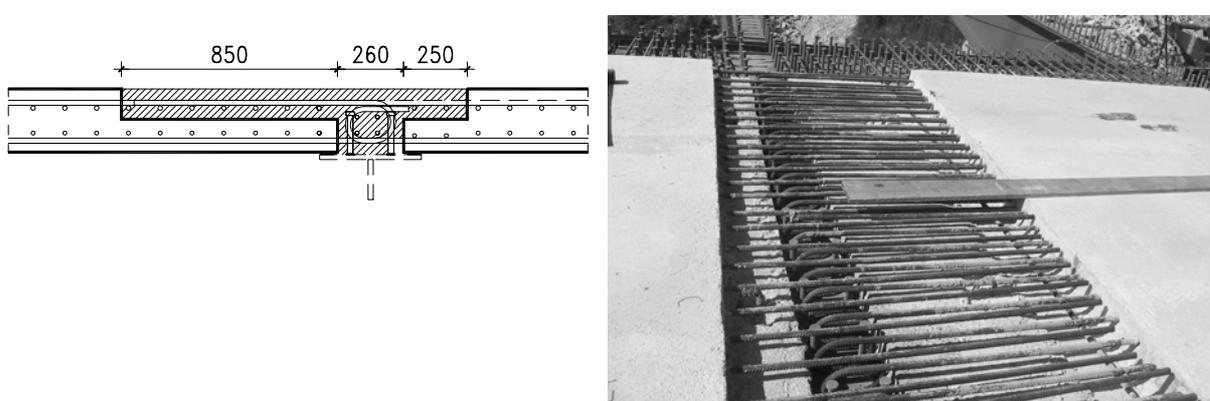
Construction joints in the precast RC slab, 25 cm thick.
